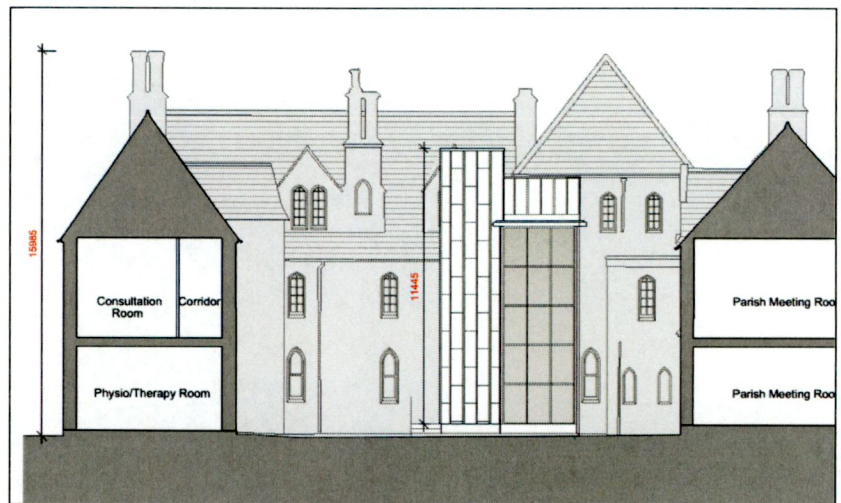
The new staircase tower 02 incorporates a lift tower clad in zinc and expresses the staircase using a glazed curtain wall.
